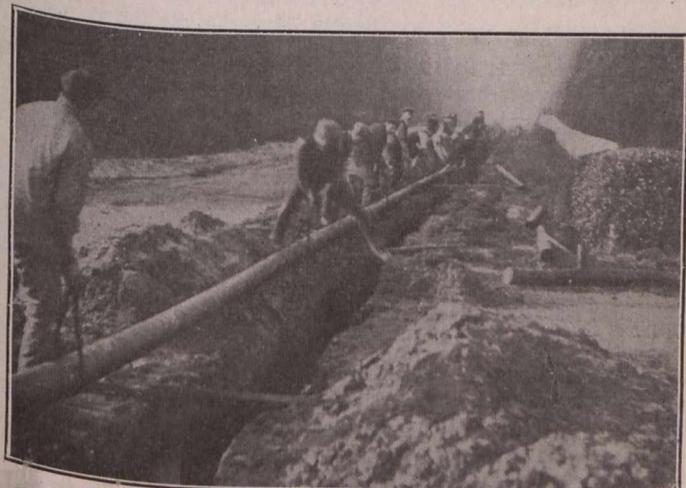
Stretch of pipe being lowered into trench after pipe has been welded above ground.
